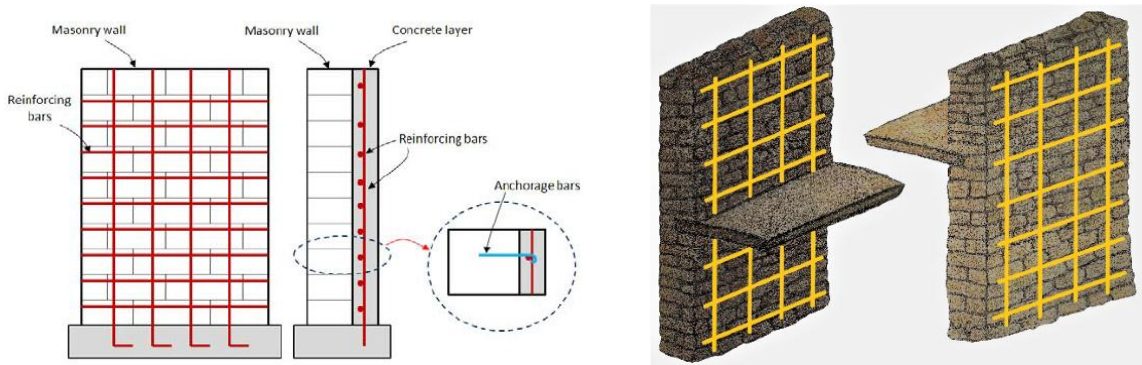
Placement of reinforced concrete layer (left), and FRP rebar (right) strengthening method for masonry walls
